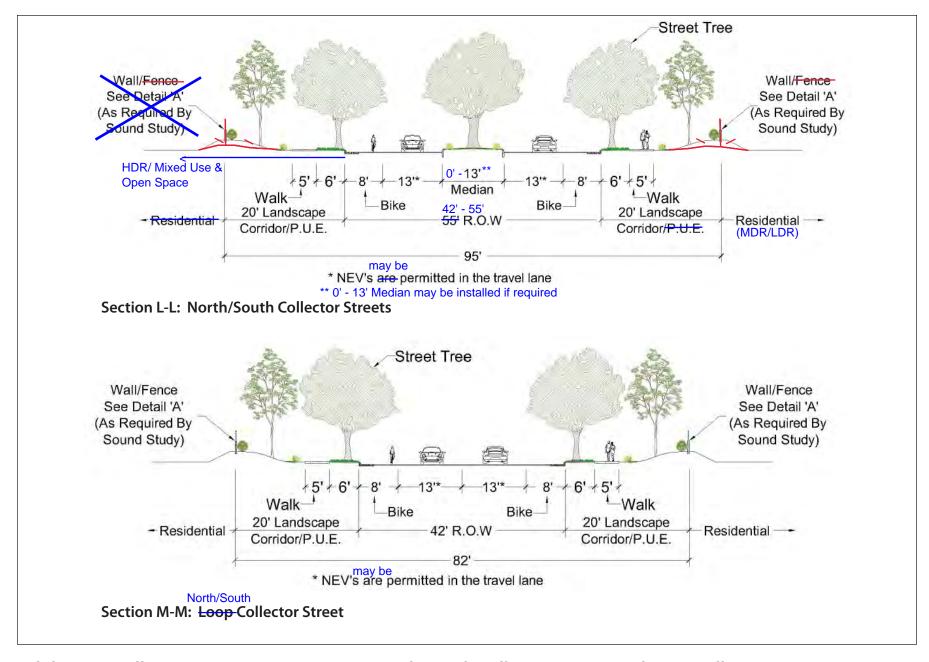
Collector Street Cross Sections - North/South Collector Streets and Loop Collector Street
